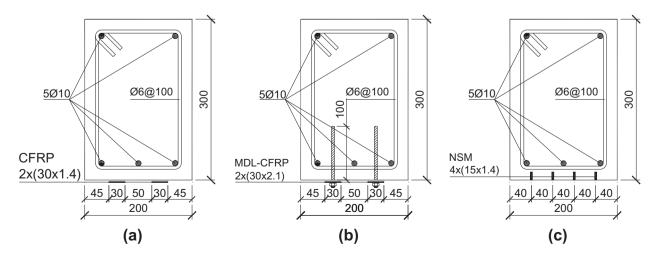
Cross section of the strengthened beams: (a) EBR; (b) MF-EBR; (c) NSM. Note: all dimensions are in millimetres.
